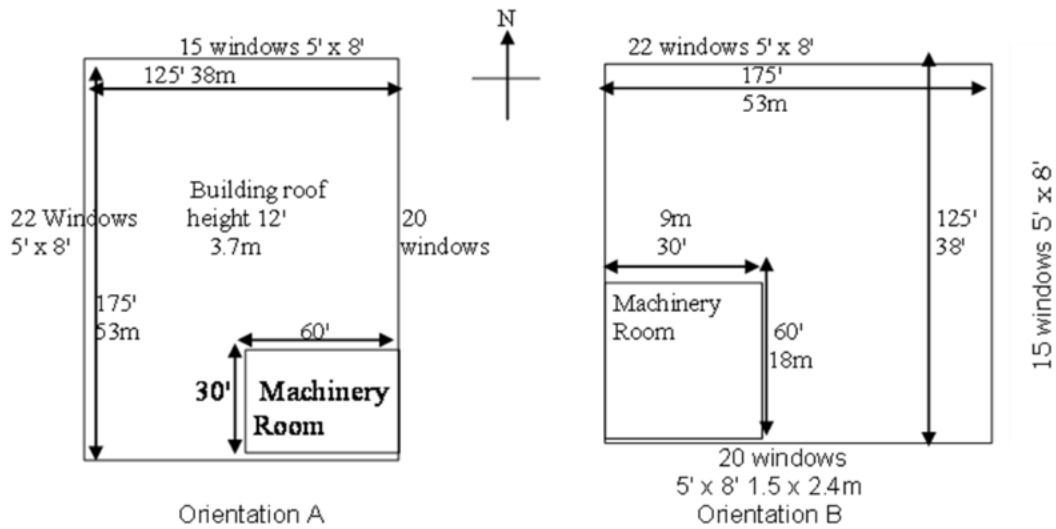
Plan View of a Workshop Building in Texas, U.S.A.
